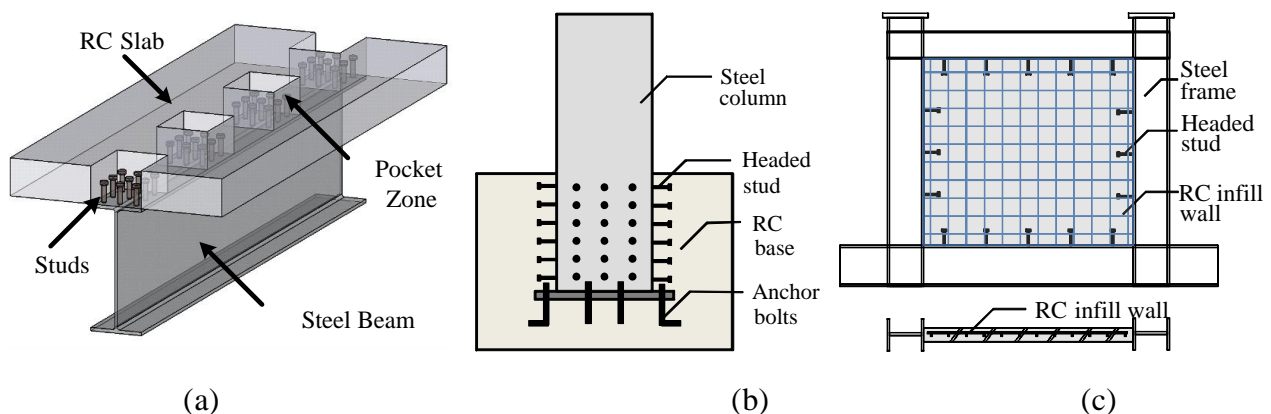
Applications of steel-concrete composite elements with headed studs: (a) Composite girder; (b) Composite column base; (c) Steel frame with infill RC wall.
